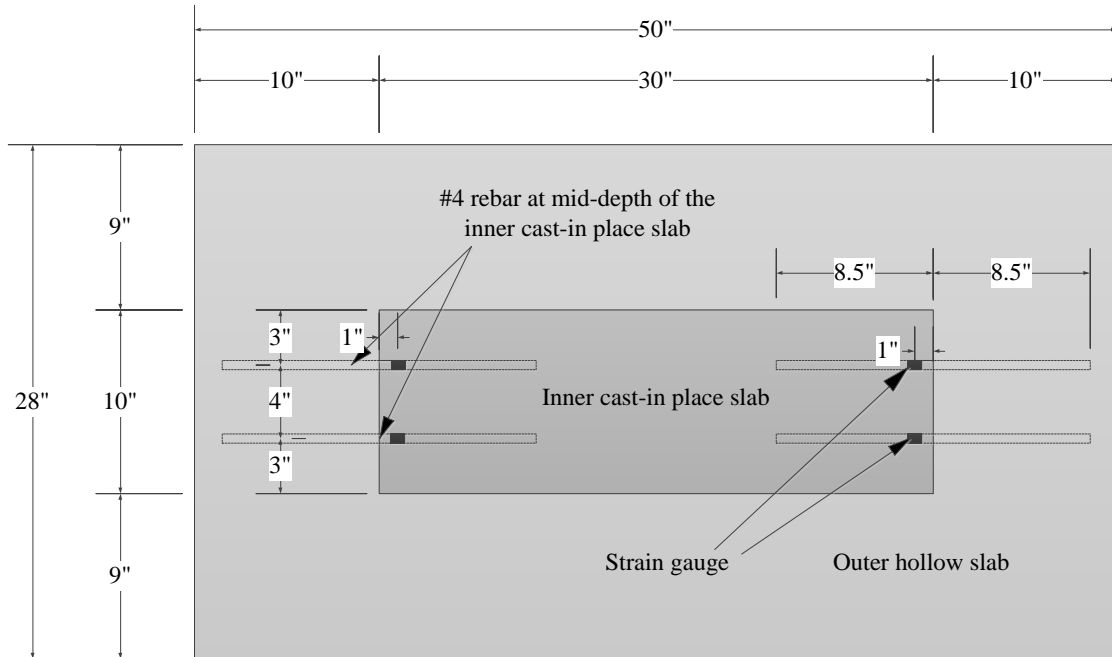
14 Specimen details for punch test specimen with No. 4 rebars and cast-in-place PC.
